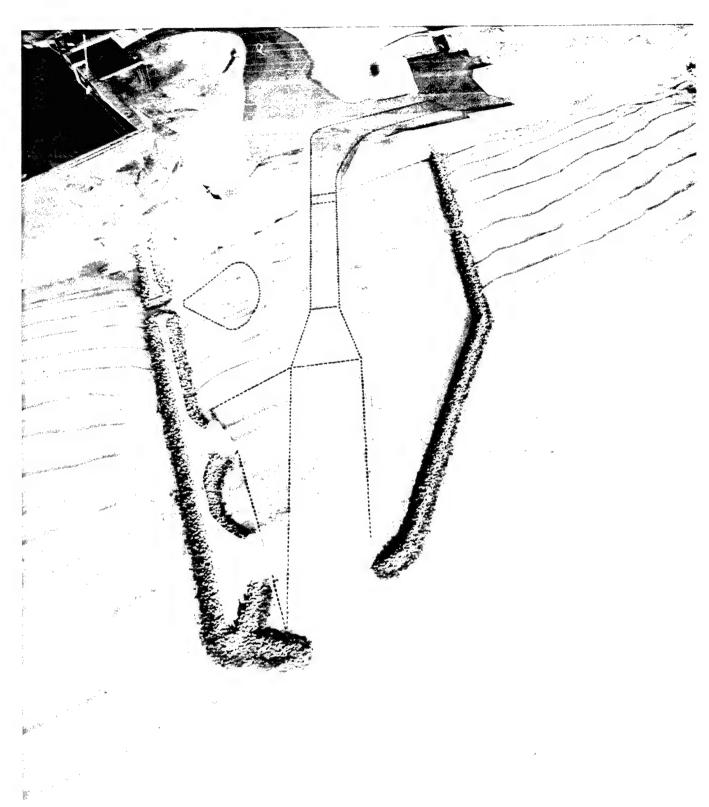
Typical wave patterns for Plan 19; 9-sec, 2-m (6.6-ft) waves from 182 deg; swl = +0.5-m (+1.6-ft)
